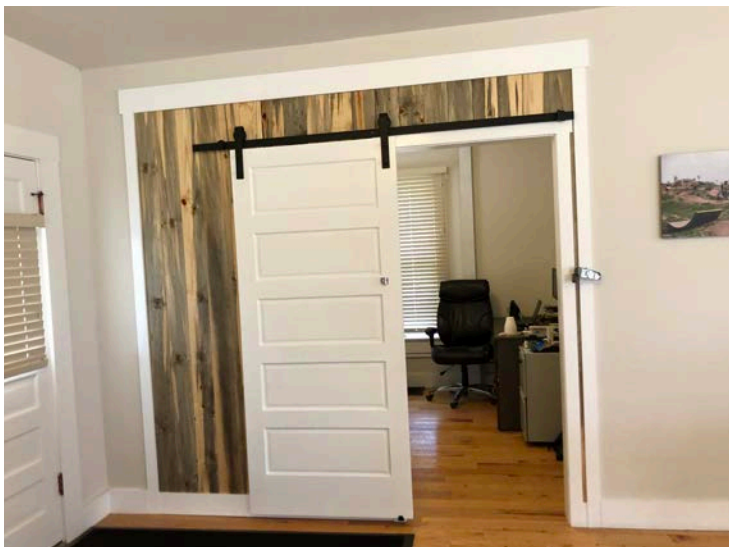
View of sliding barn door and infill wall, 2020 (source: Ratio)
